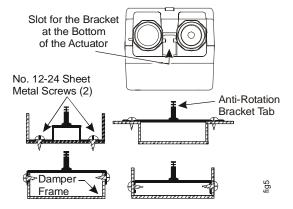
Fitting the Anti-Rotation Bracket on the Damper Frame or Duct
